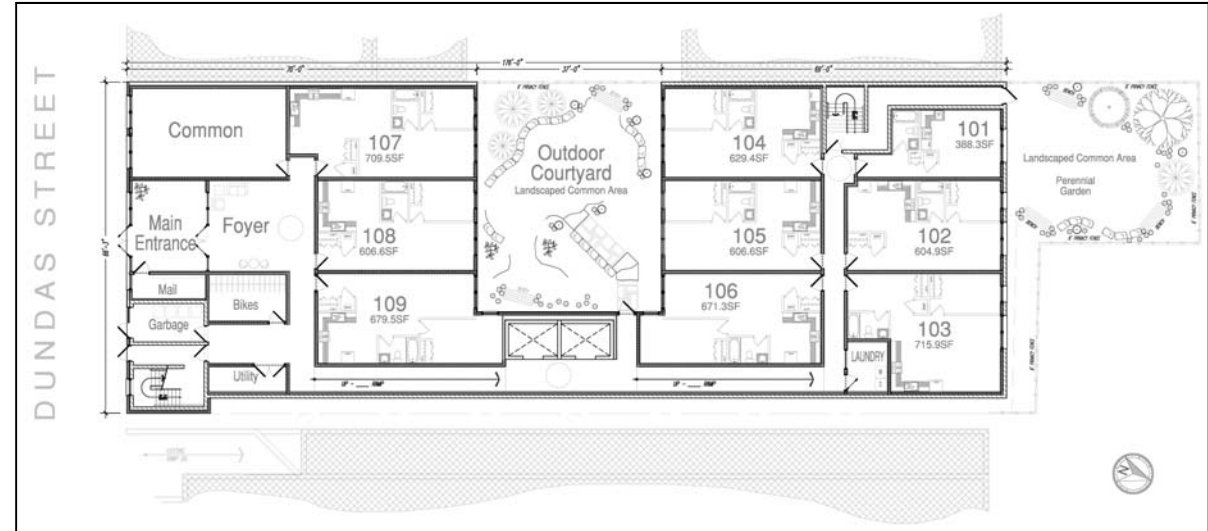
Proposed Main Floor plan showing courtyard and landscaped areas
